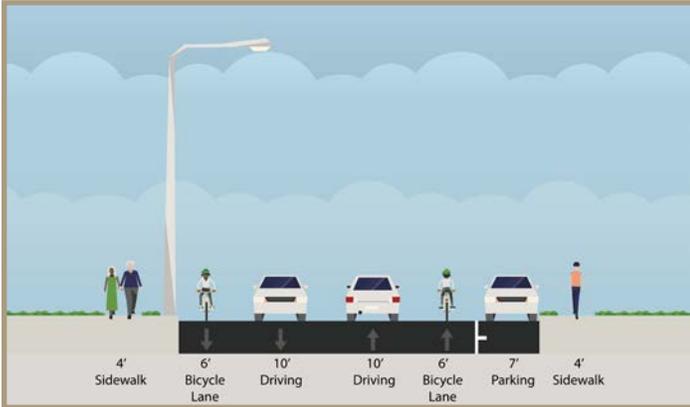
Looking west on Brooks Boulevard, from 13th Avenue.
